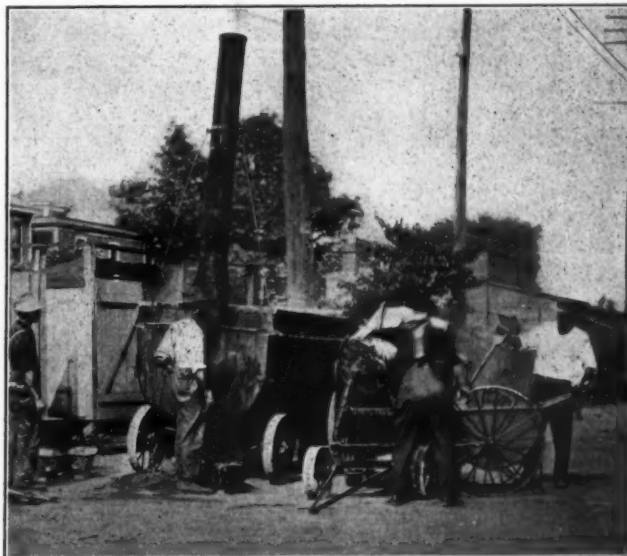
EQUIPMENT FOR MIXING PITCH-SAND FILLER. Tar kettle and "Big and Little" mixer.
